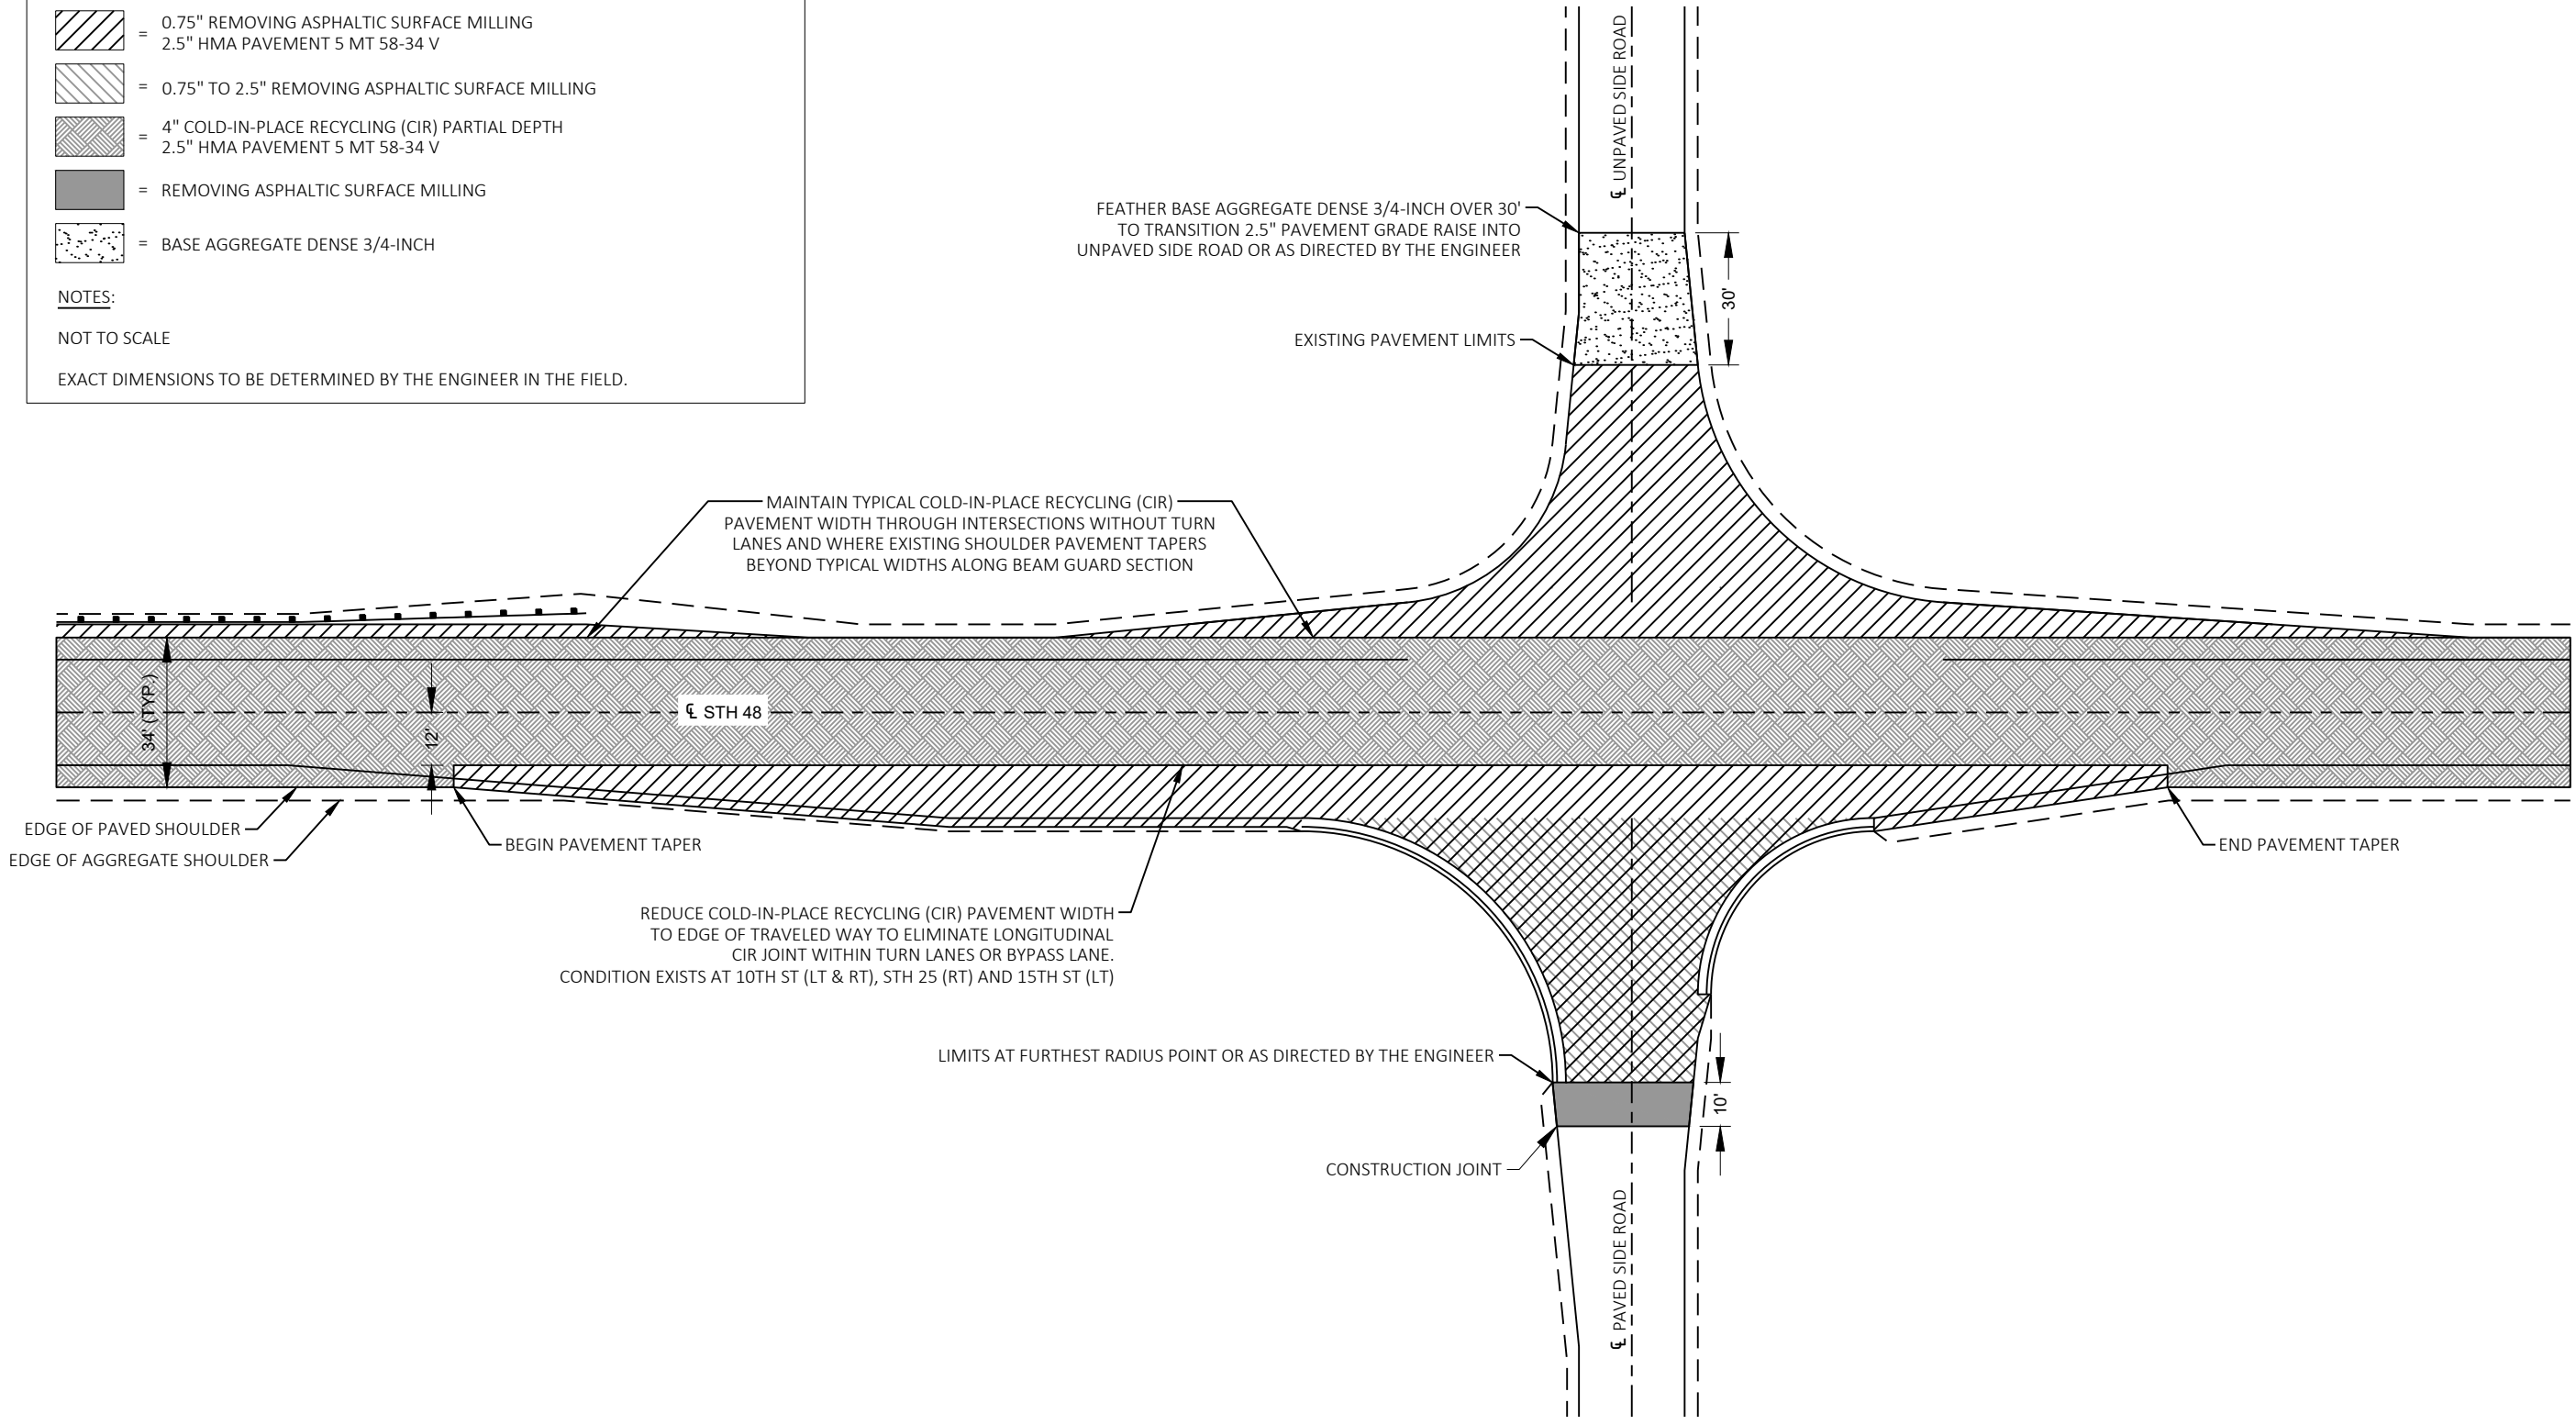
DETAIL OF PAVEMENT GRADE RAISE TRANSITION
